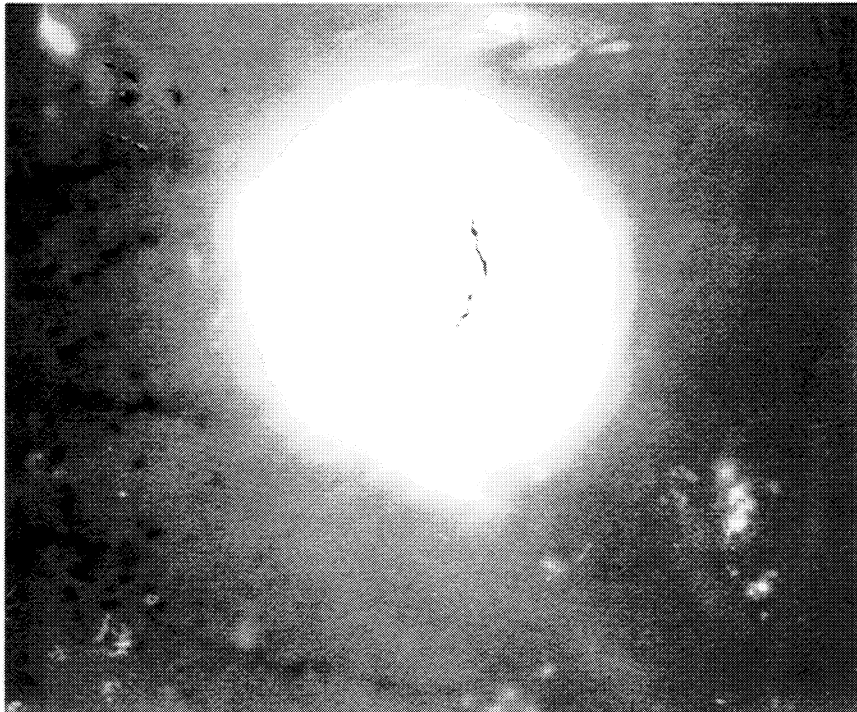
Behind Wall Debris Pattern for Test 7698-2
